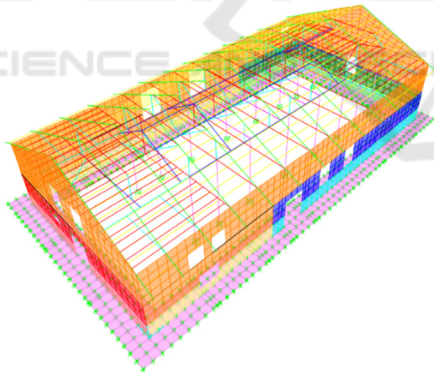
Variant 1 3D model of the masonry structure and the timber roof.
